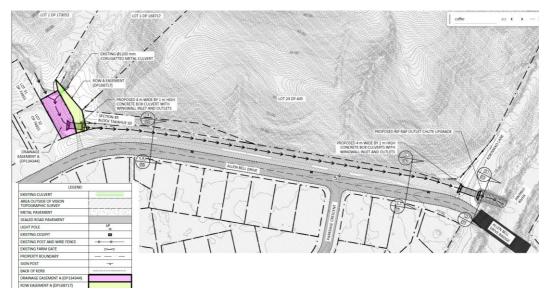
Existing site and servicing plans showing the existing drainage easement area in pink and location of existing open drain. Full scale drawings provided as Appendix 2.
